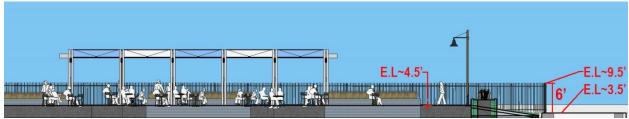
Site section created by City staff showing the proposed fence behind covered seating area, looking north. The existing pier platform is on the right.
